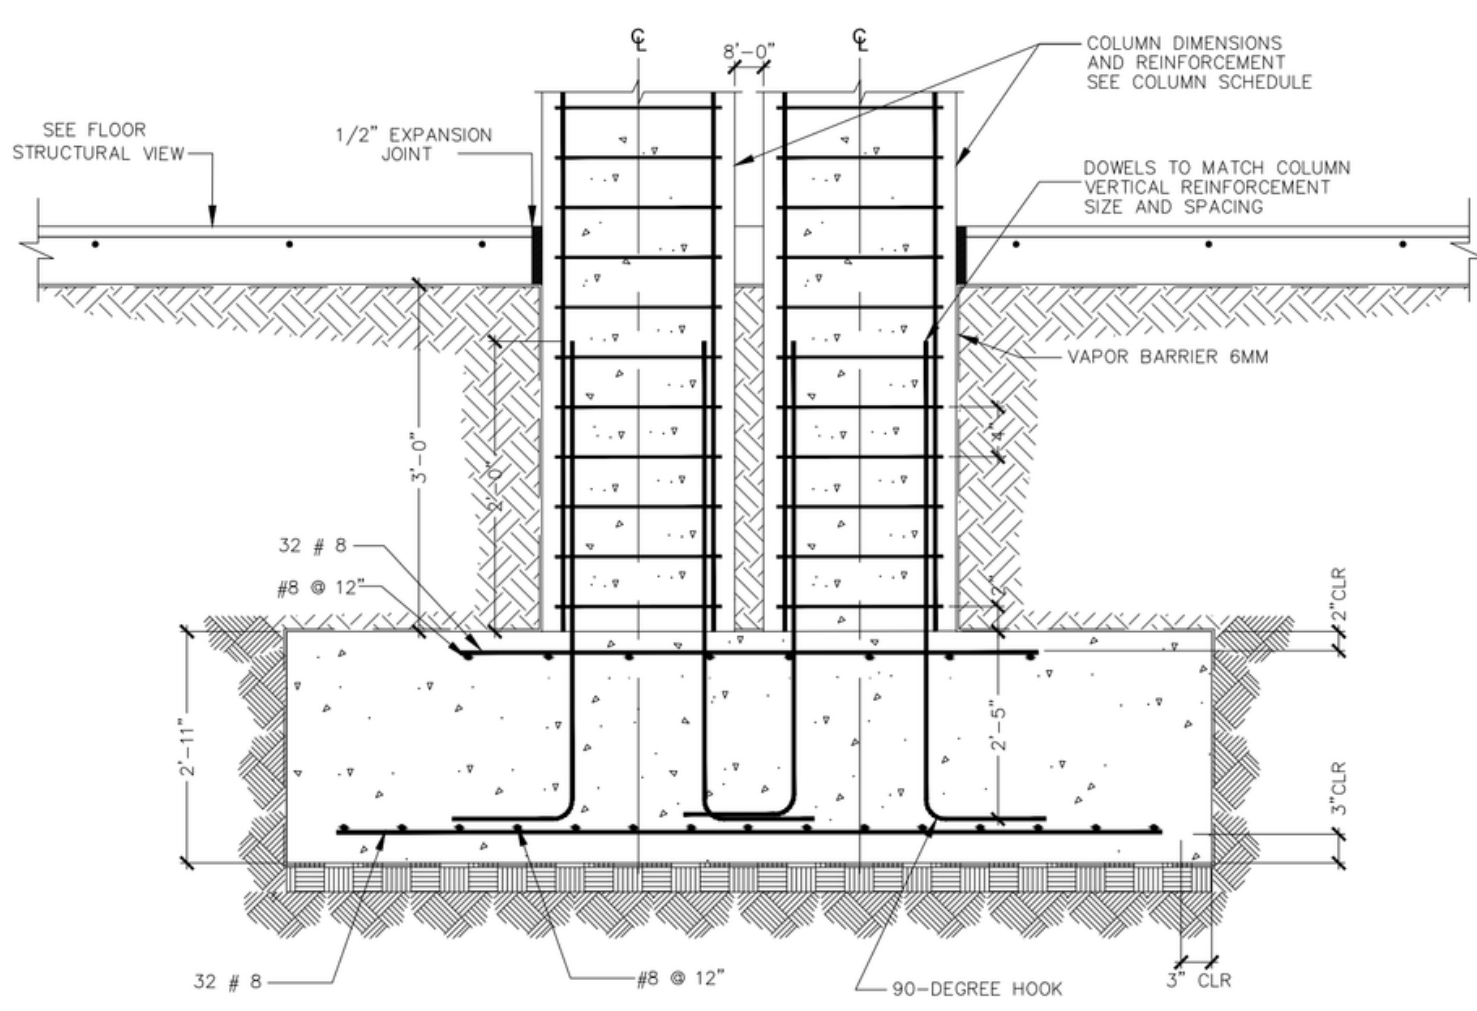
Multi-Level Parking Structure Foundation Reinforcement
